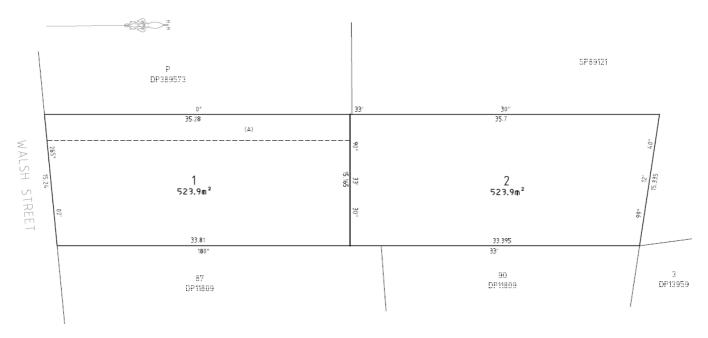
Proposed plan of subdivision (Source: Donovan Associates)
